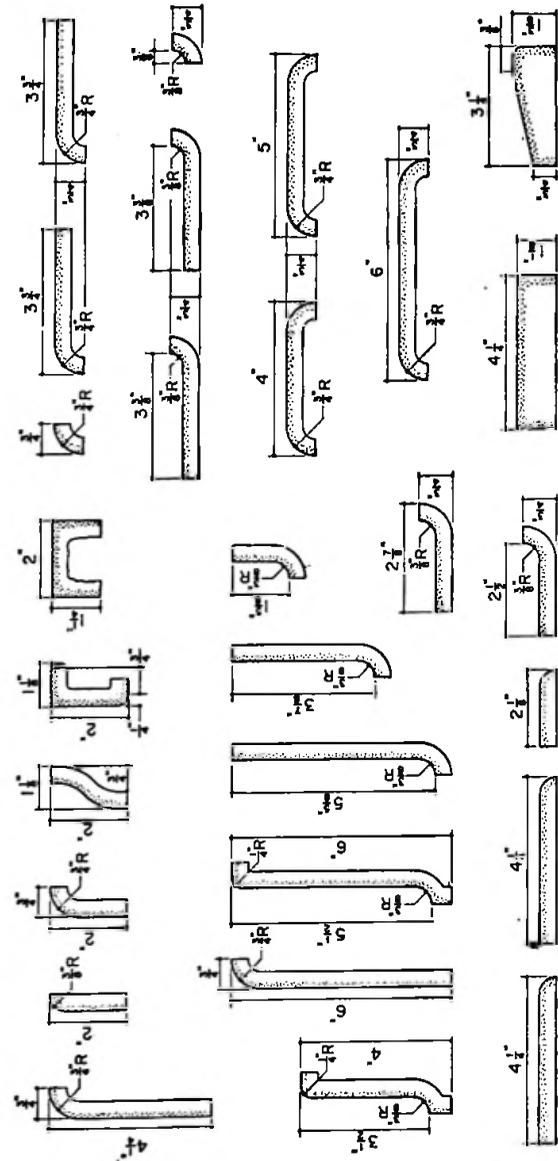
STANDARD TRIMMERS FOR GLAZED WALL TILE
